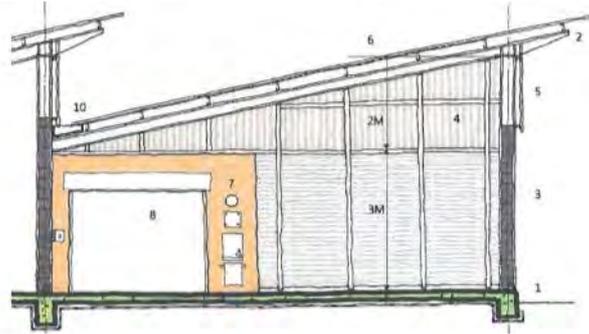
(Right) Typical section through workshop unit indicating skylight in the top right. Built using standard building materials; concrete, concrete block, mild steel and steel roof sheeting. (John Royal Architects)
